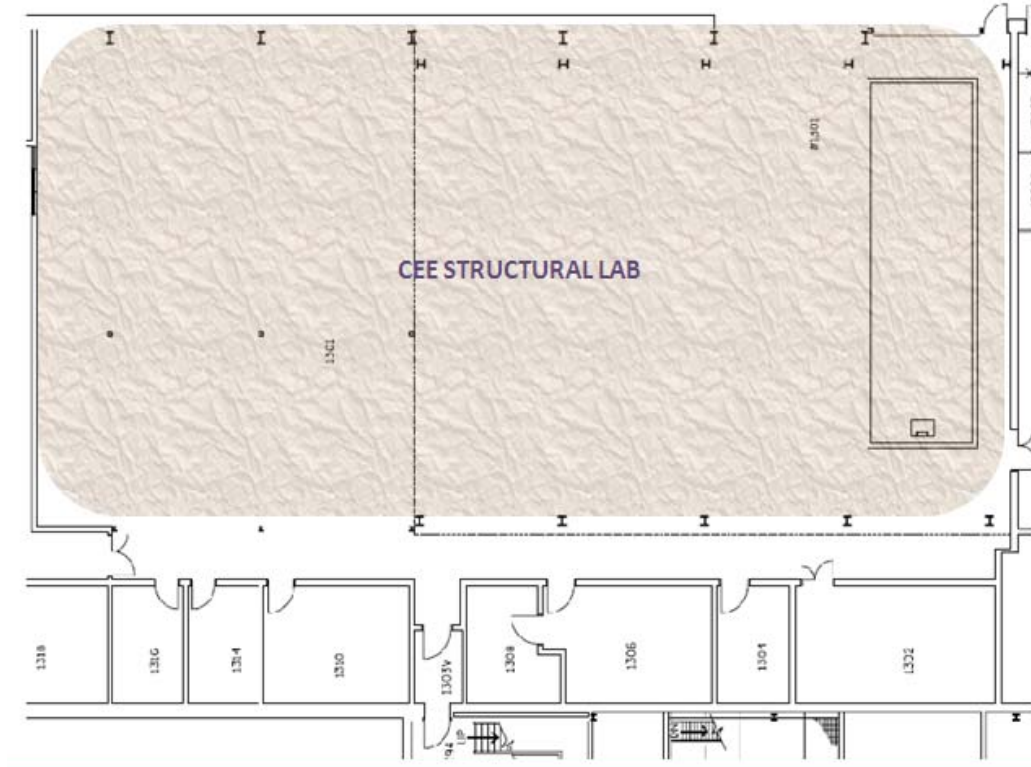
Floor Plan of CEE Structural Engineering Laboratory
